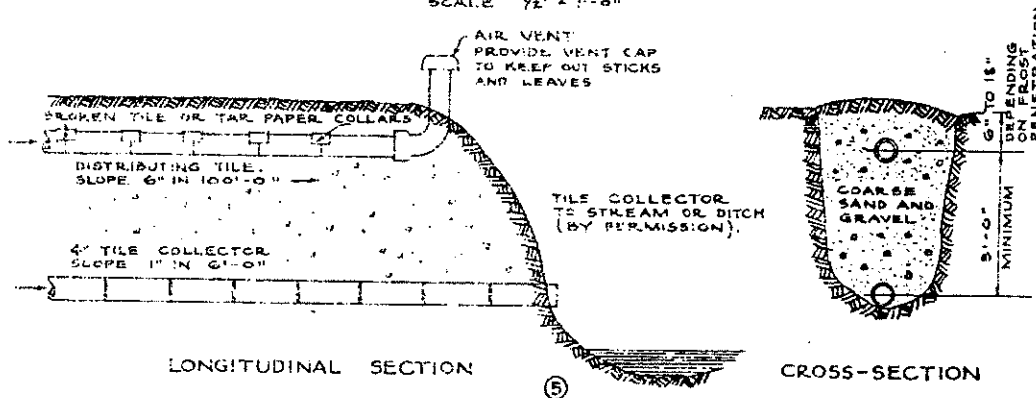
DETAIL OF TRENCHING SYSTEM IN POROUS SOIL
